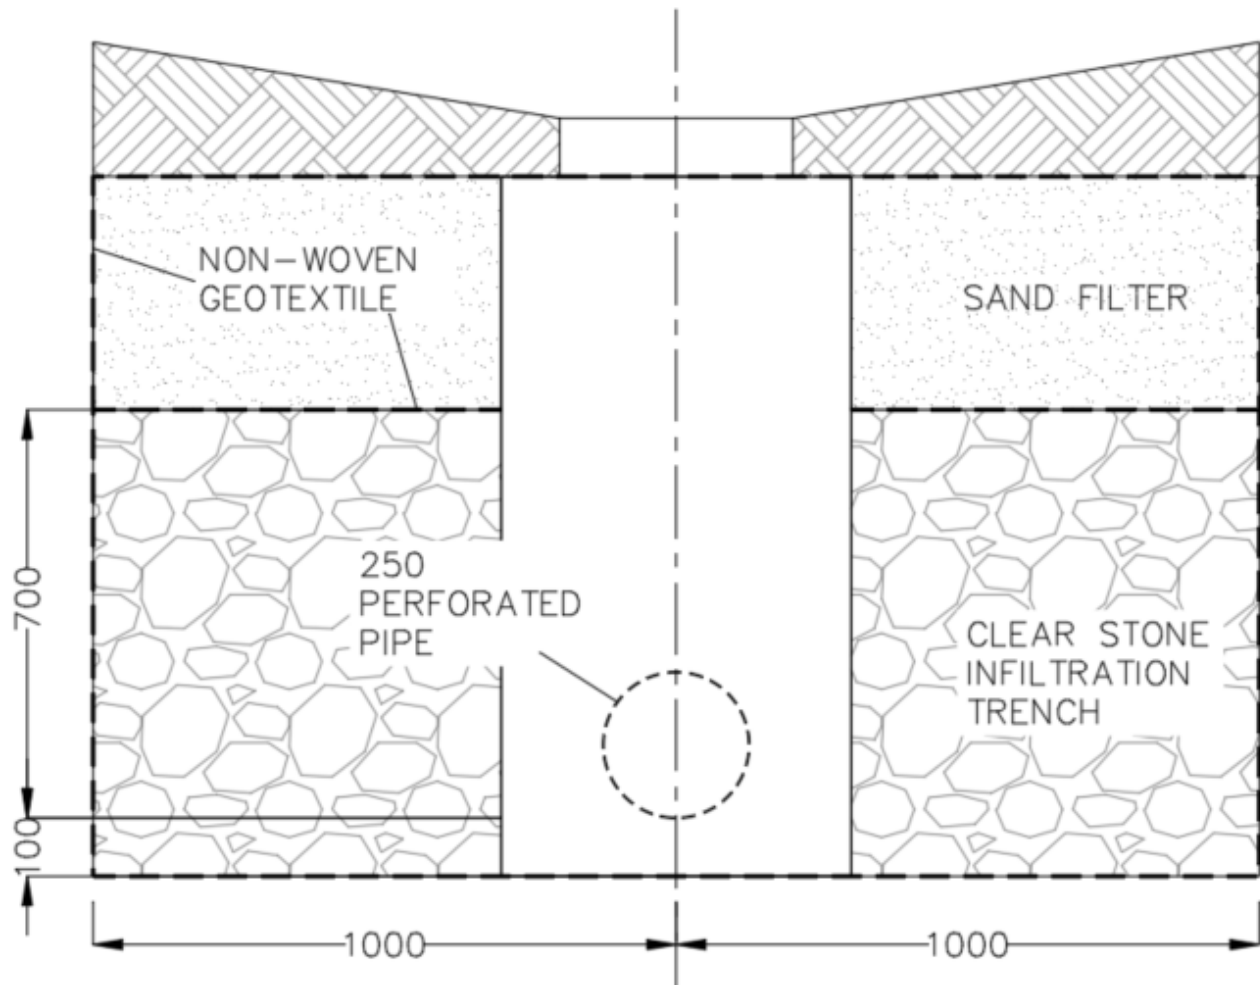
Infiltration Trench and Catchbasin Section Details
